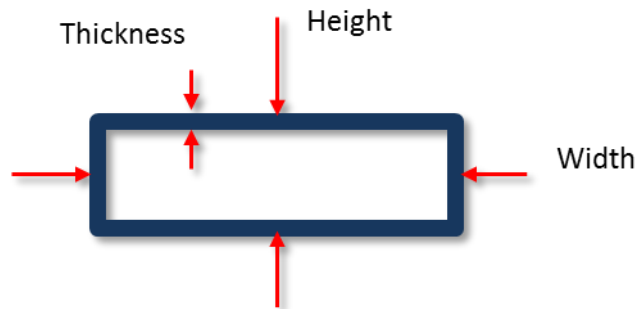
GENERIC BEAM CROSS SECTION SHOWING THREE VARIABLES USED TO TUNE STIFFNESS
